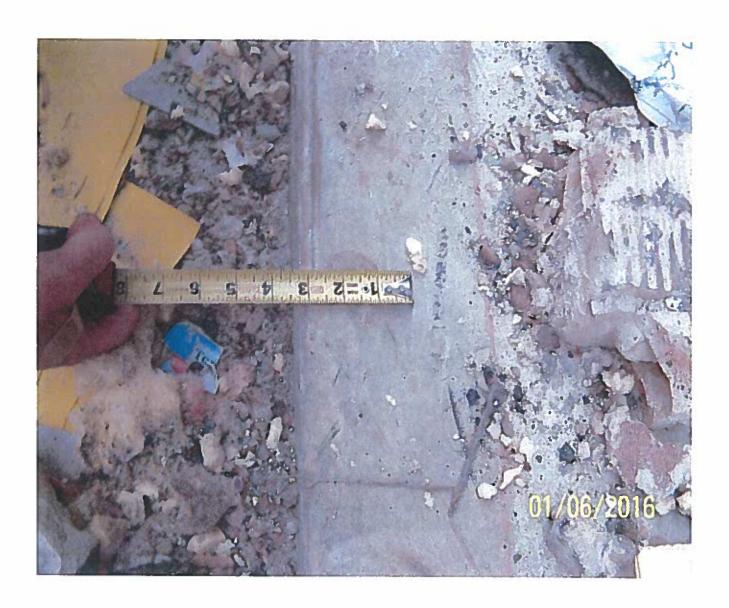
Another example of fastener too close to edge of concrete. This was consistent thorough failed walls.
